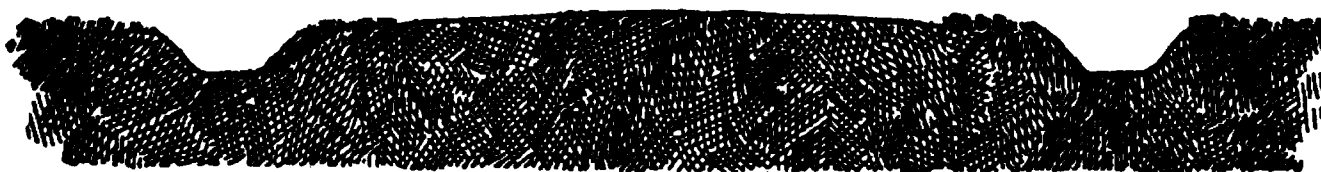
Showing cross-section of an earth road 18 feet wide; bordered on each side with 3 feet of grass, outside of which are placed the surface drains when needed. The center of the road is three inches higher than the sides at the grass.
